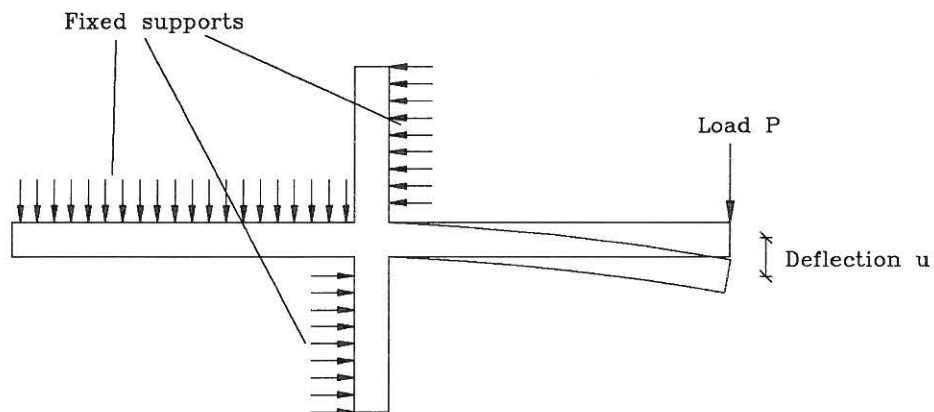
Schematic set-up of static testing of reference and damaged specimens.
